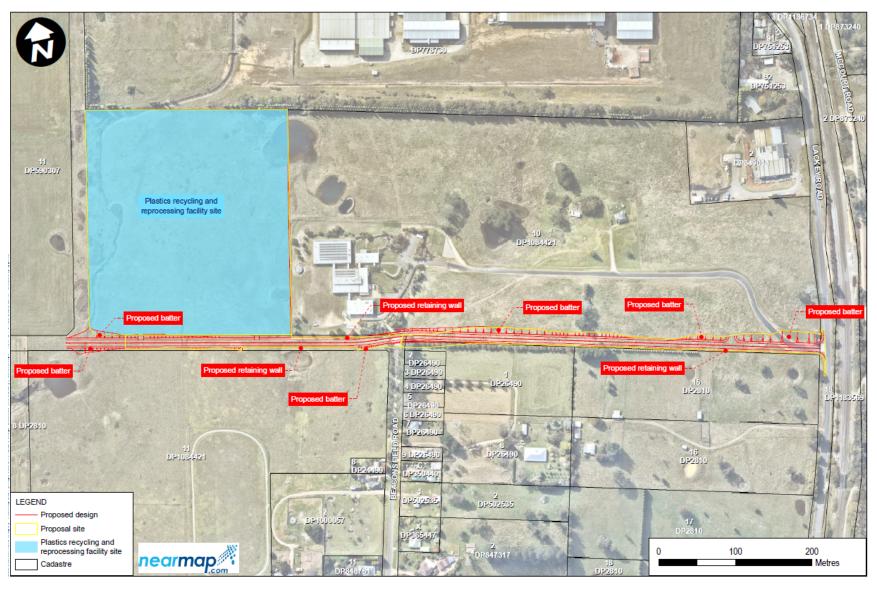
Option 2a: New access road - Connecting Lackey Road with the plastics recycling and reprocessing facility site
